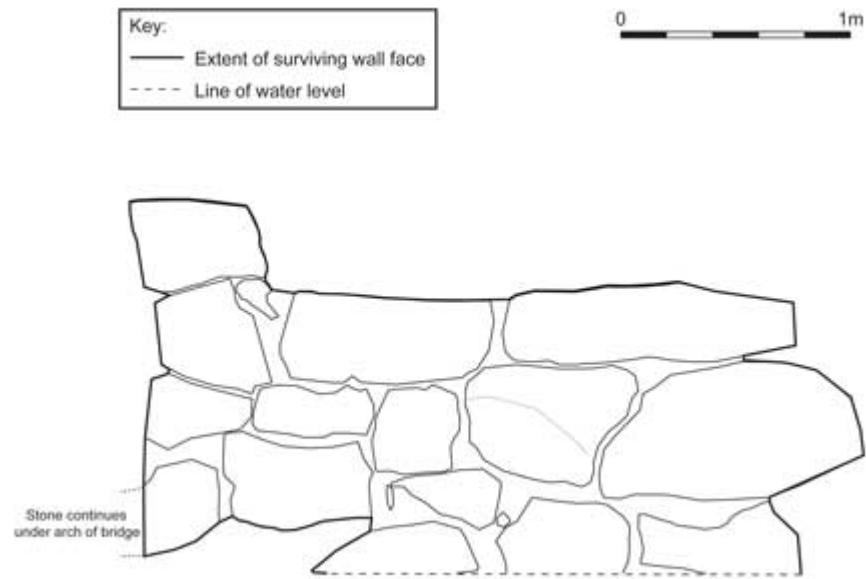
; Structure 3, Rusticated Bridge #1 (Upper Bridge): Elevation b
